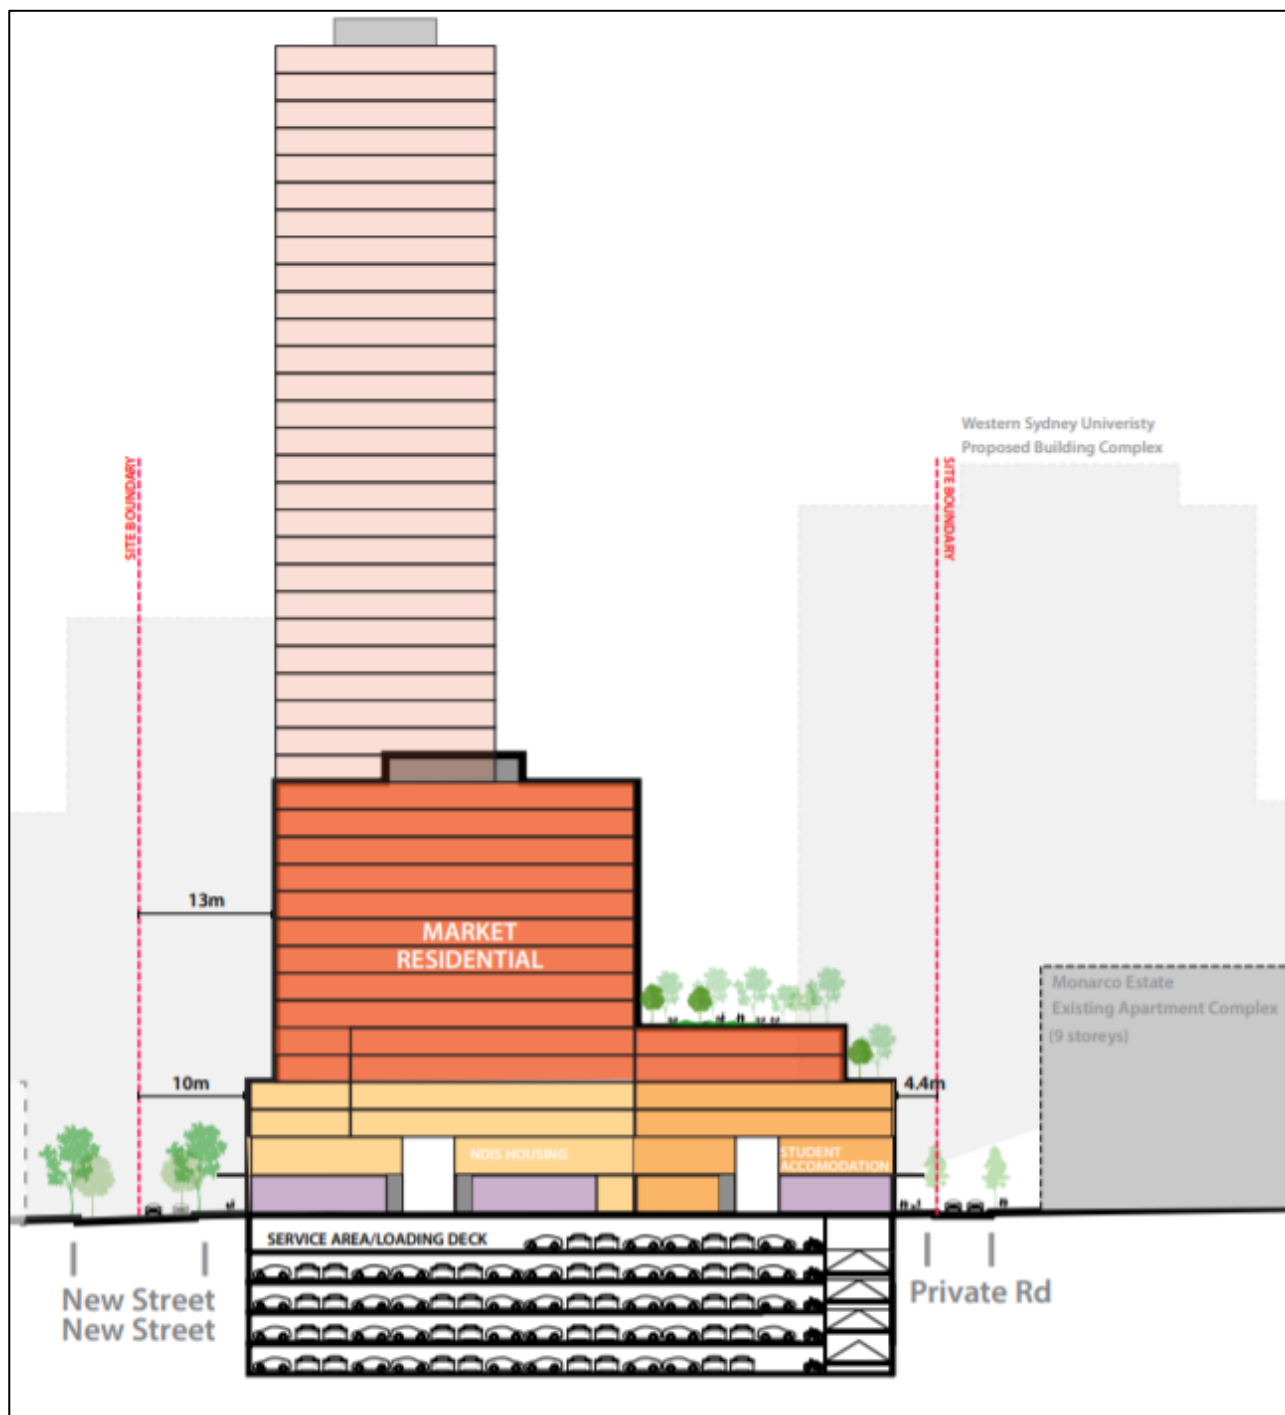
Added Value Height of Buildings for 93 Bridge Road, Westmead (Roberts Day 2020)
